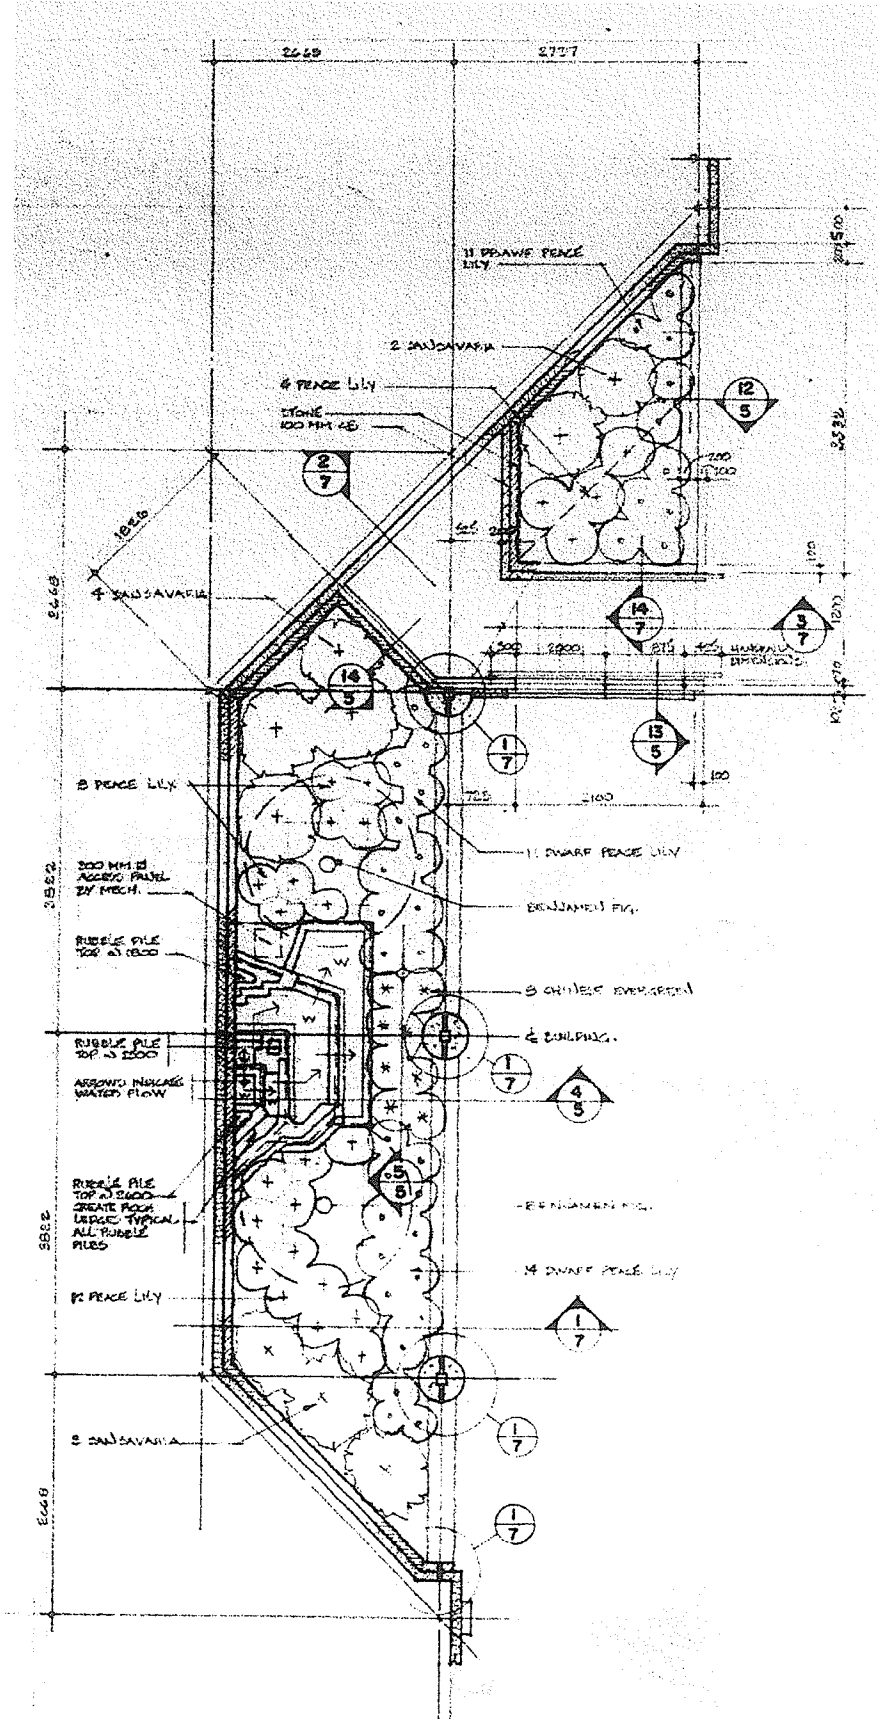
Architect construction document, Atrium Plan. Courtesy of the architect.
